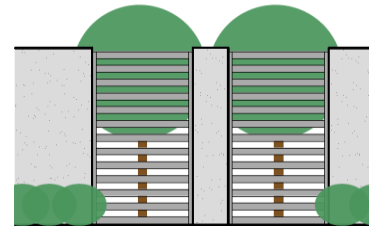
Semi-permeable fencing – 1800mm high brick wall with 1800mm high permeable infill panels
